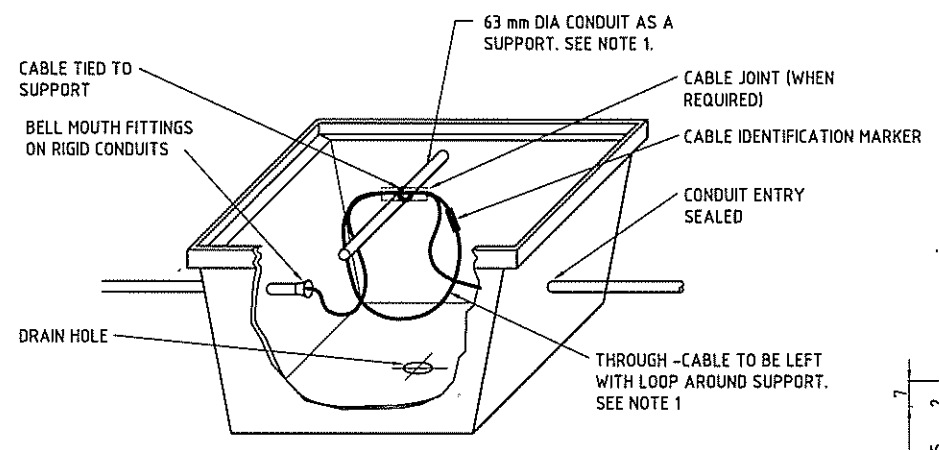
DETAIL OF CABLE JOINTING IN POLE CABLE PIT
